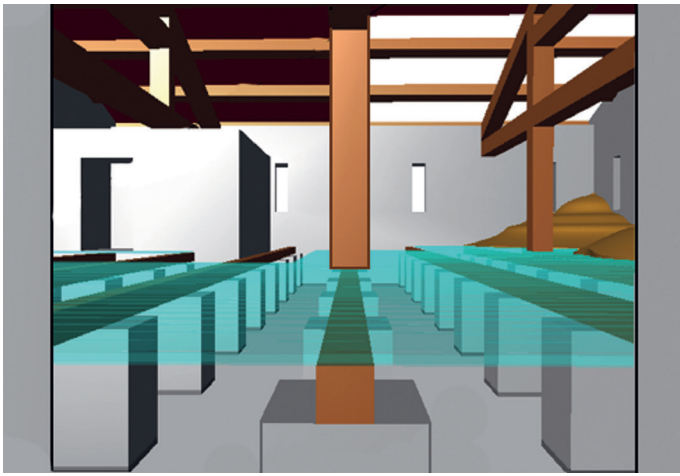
3D reconstruction of the internal space (stone blocks, beams and transparent wooden plank flooring) (F. Martorella).
